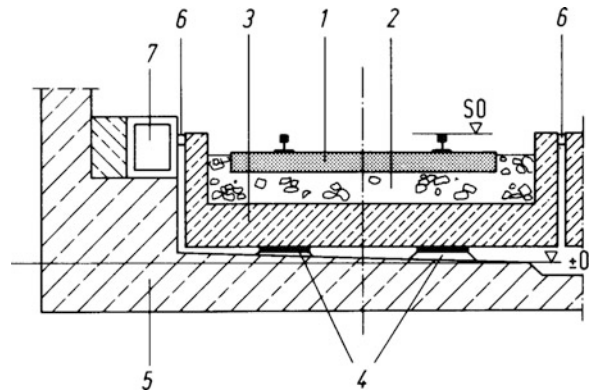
Outline sketch of track superstructure designed as a “mass-spring system” with trough track design, based on the example of a dual-track light rail tunnel with rectangular cross-section. 1 track frame, 2 ballast or filler concrete, 3 concrete trough, 4 resilient bearing with bearing mount, 5 tunnel floor, 6 elastic seam seal, 7 cable routing duct
